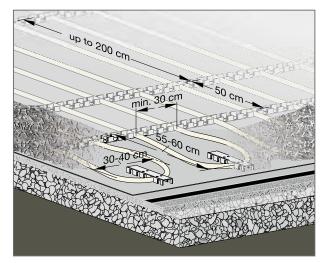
Mounting on clamping rail, e.g. Fonterra pipe 25x2.3mm
